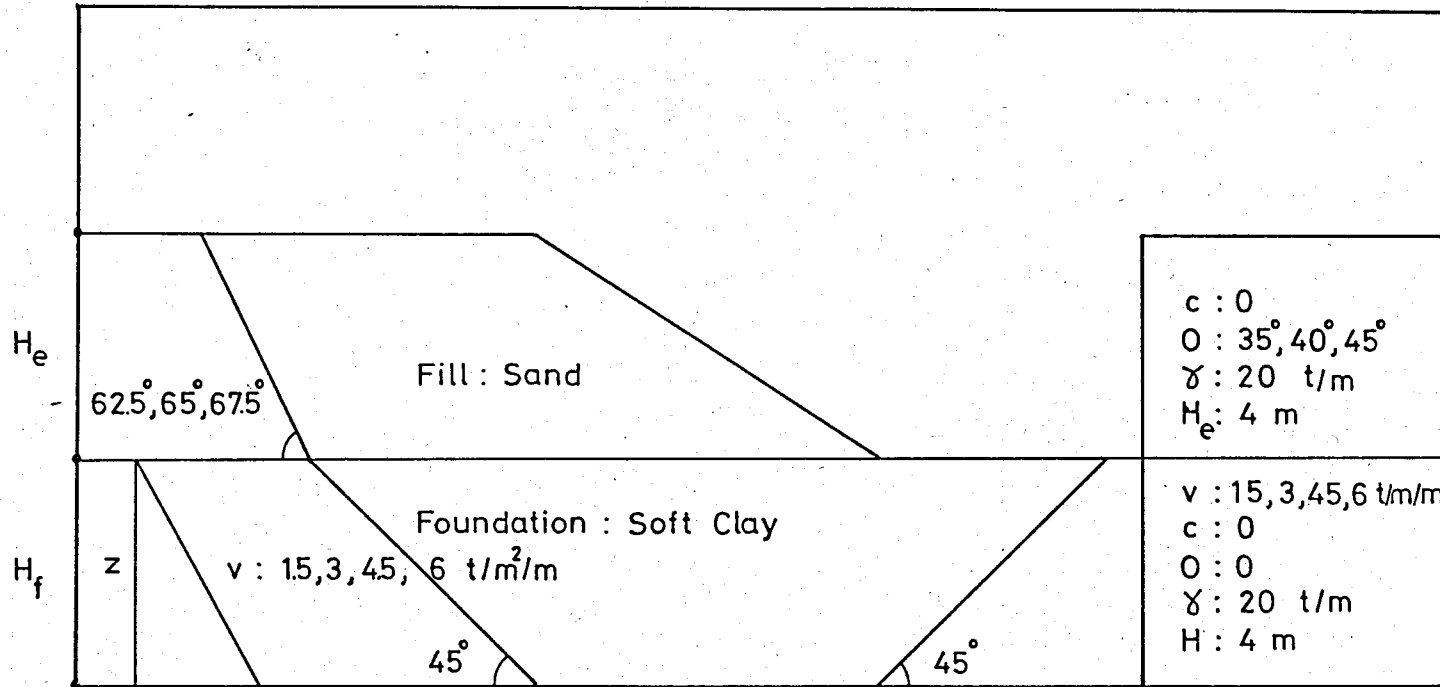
Dimensions and Properties of the Embankment and Foundation for Linear
